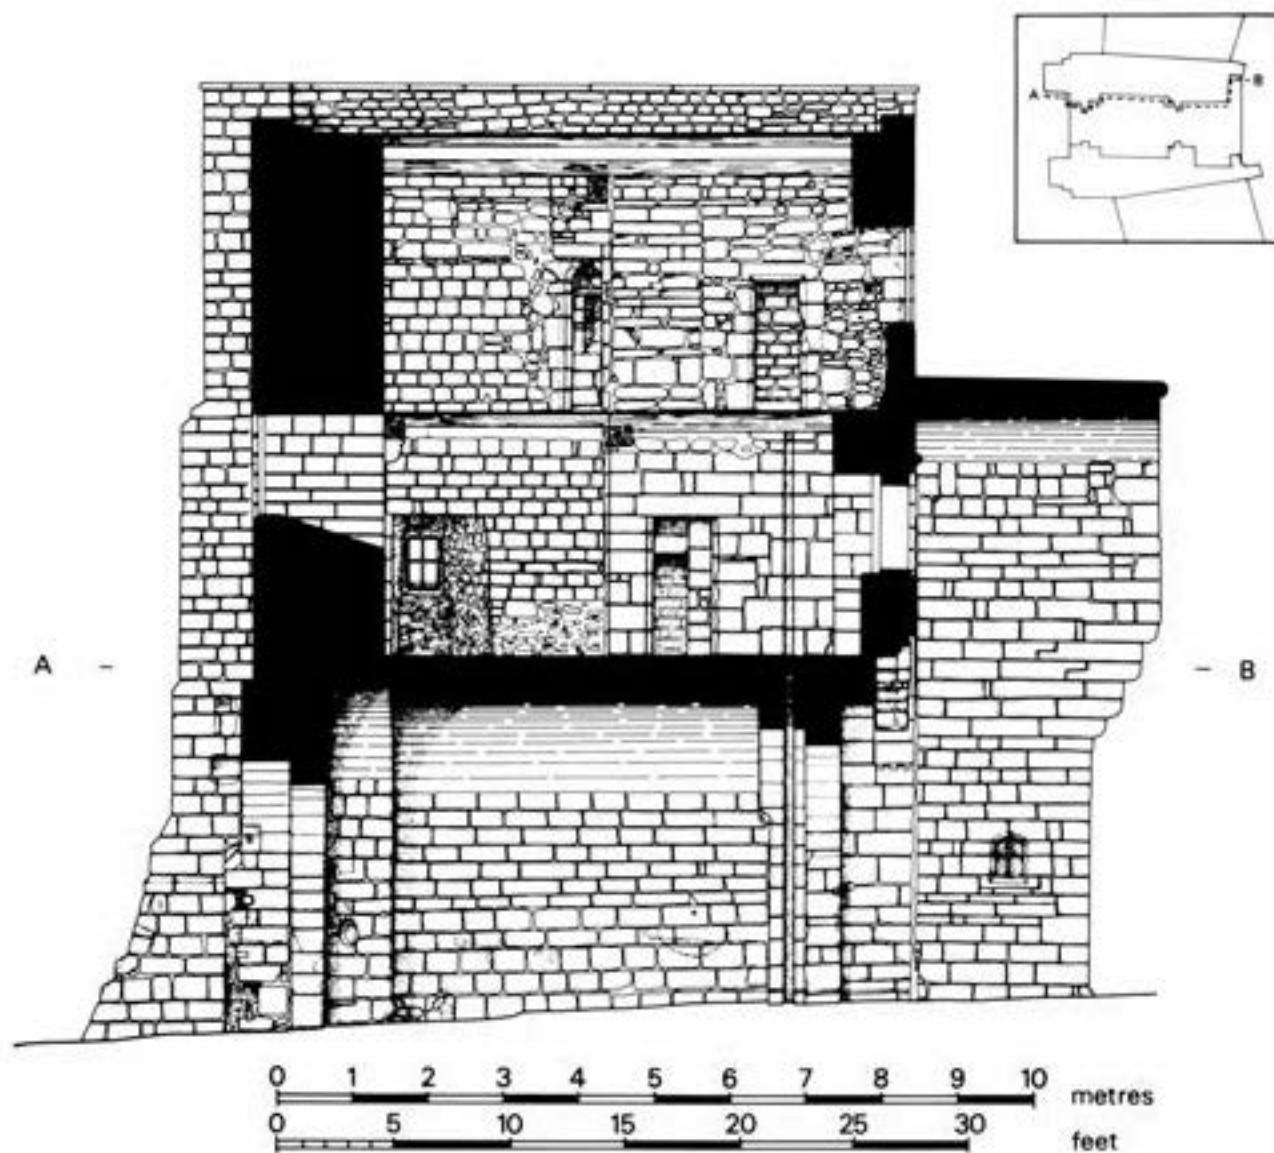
The inner gatehouse; internal west-east elevation of the north wall section along the gate passage, showing ground, first and second storeys
